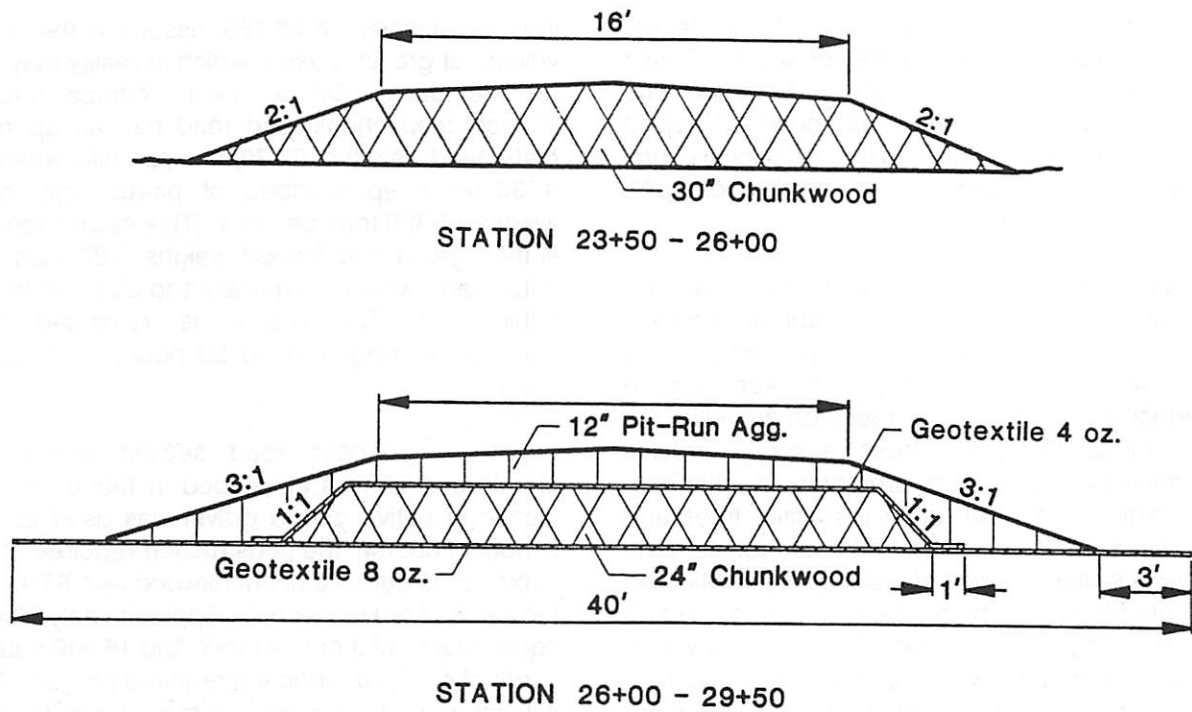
Typical cross sections of chunkwood test demonstration roads.
